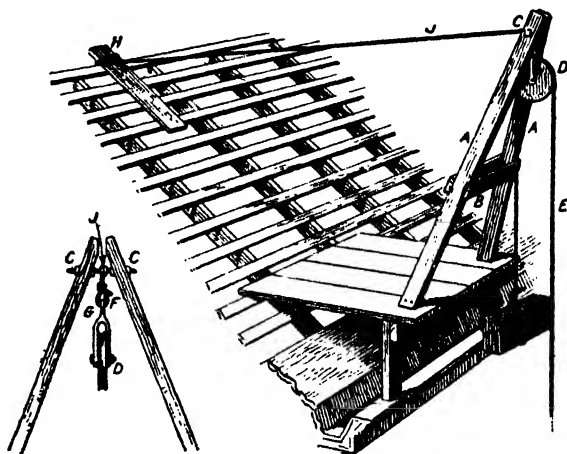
Details of one Form of Derrick used in Raising Slate to Roof
